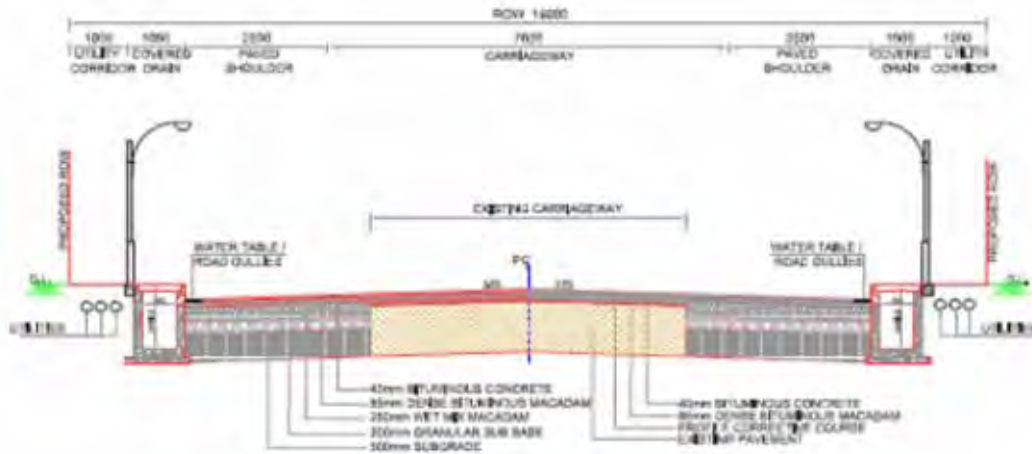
C4-V – O Two Lane Carriageway with Paved Shoulder in Village Area (Overlay)
